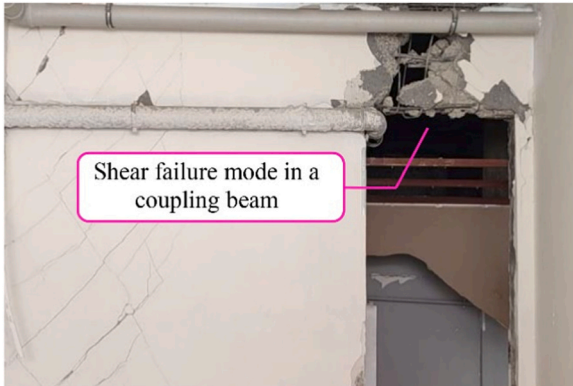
Shear failure of a coupling beam in a Tunnel-Form Building (Turkey, 2023).
